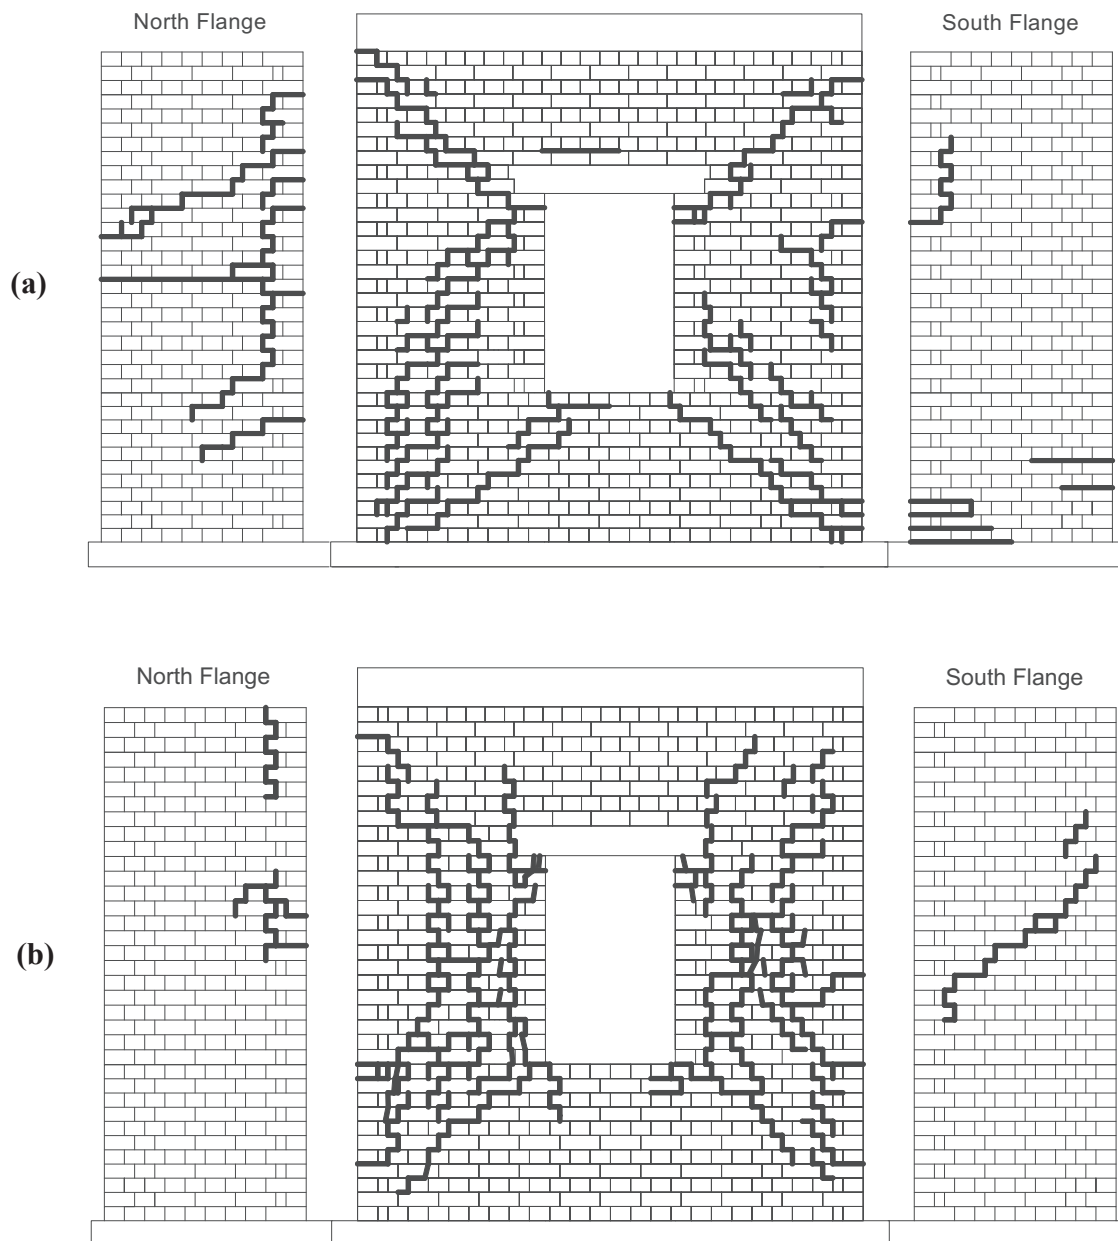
Crack patterns: (a) SF1 wall, (b) SF2 wall.
